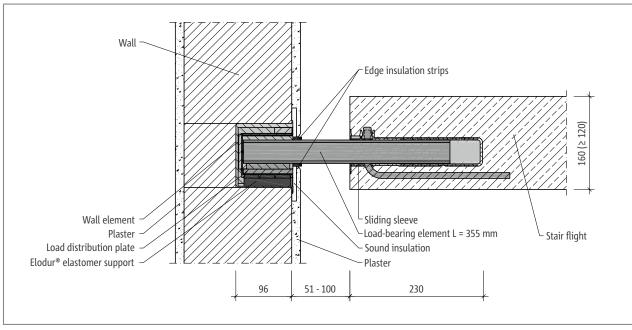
Schöck Tronsole® type Q-FV-XL or Q-A2-XL: Installation cross-section
